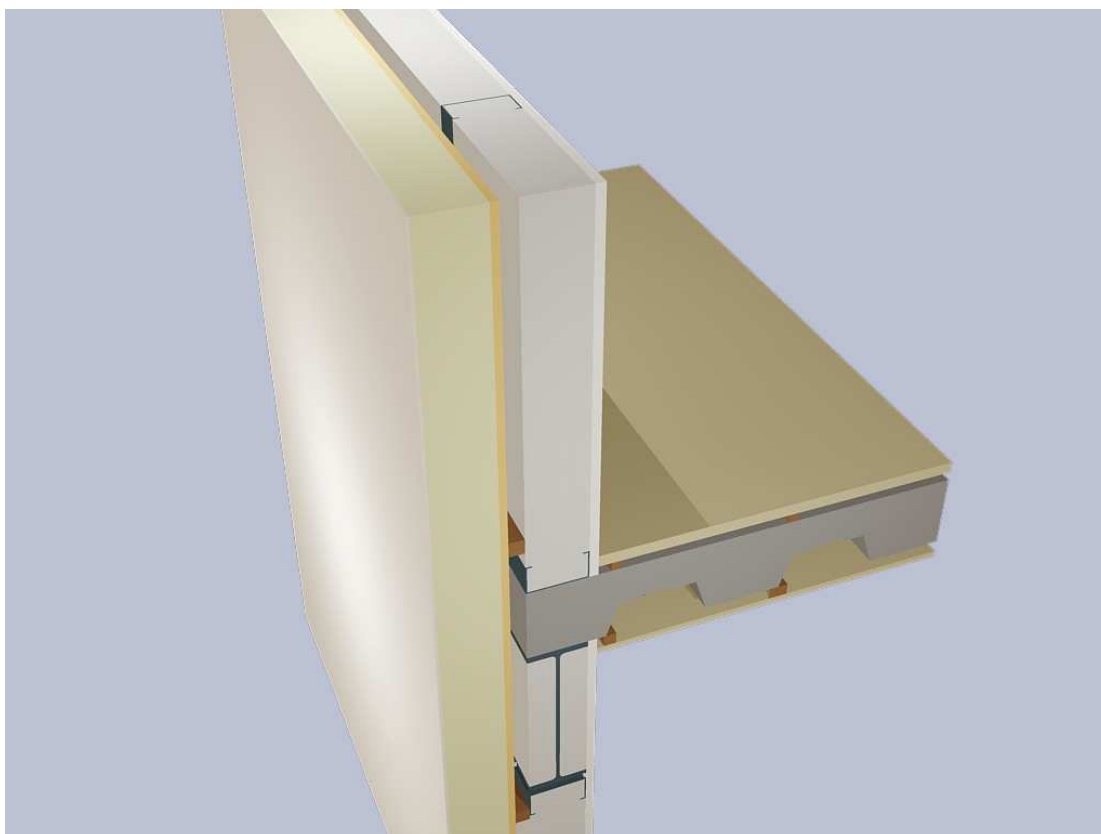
Cavity infill system using one layer of *Aqua Board* in a steel framed building
